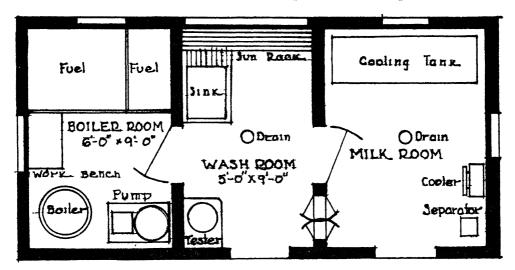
Floor plan of an inexpensive dairy house, 20 by 10 feet.
